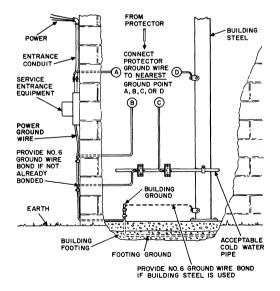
Acceptable Water System or Building Ground—Power Service Grounded to Building Ground
